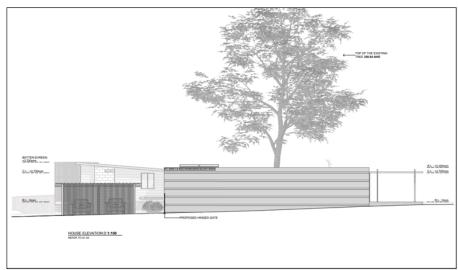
South facing elevation of the proposed development, facing the boundary with 56 Hall Street.
